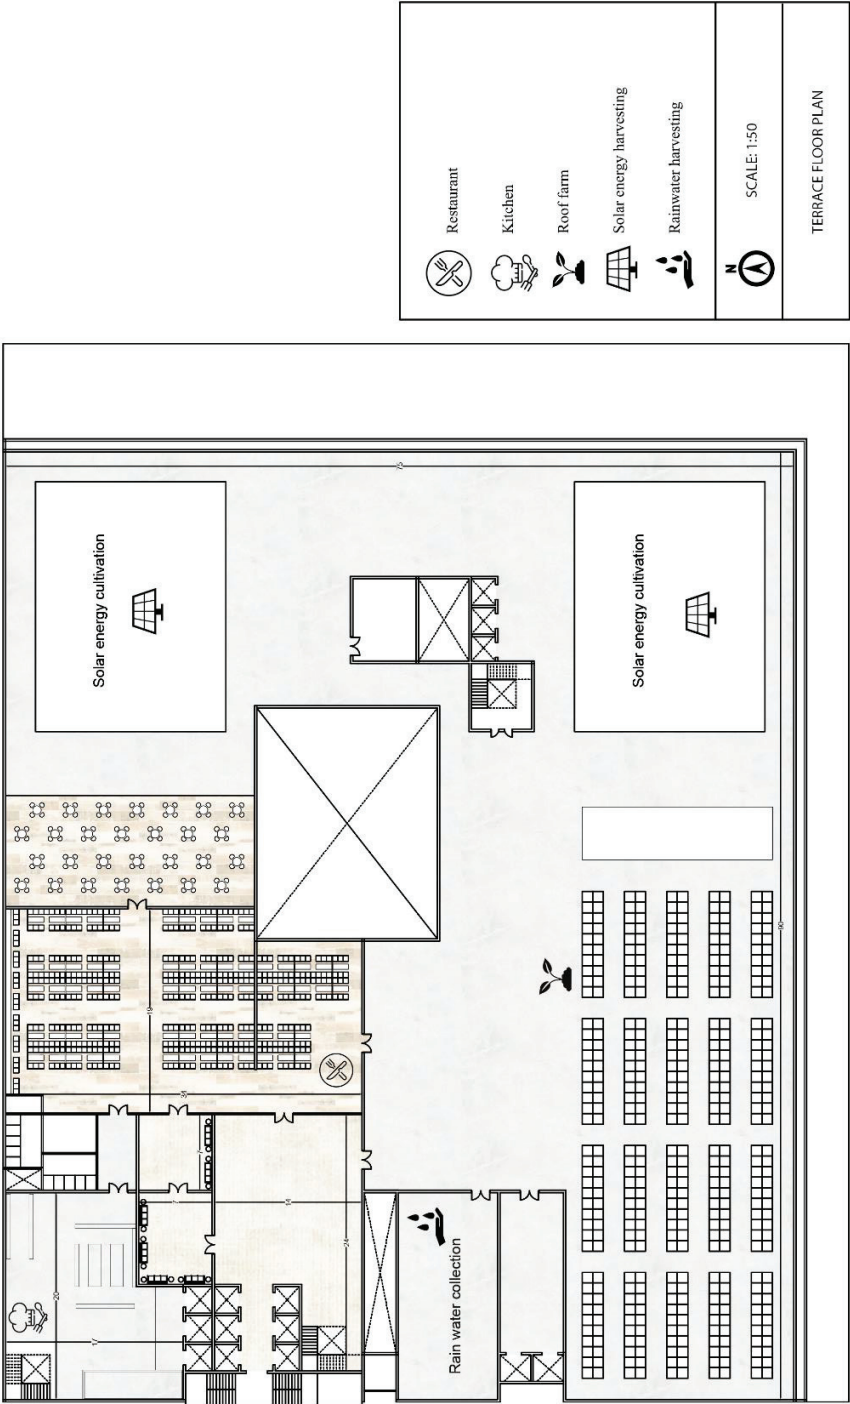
Terrace floor plan (Illustrated in Adobe Photoshop)
